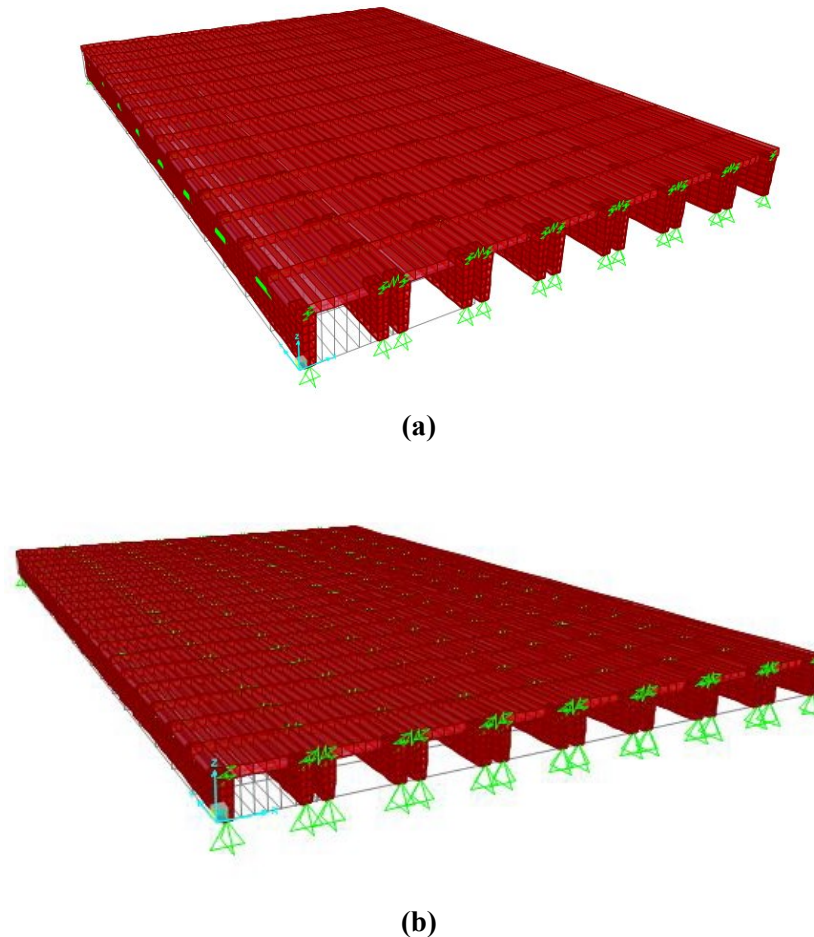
Analytical models developed in CSi Bridge: (a) Bridge A and (b) Bridge B
